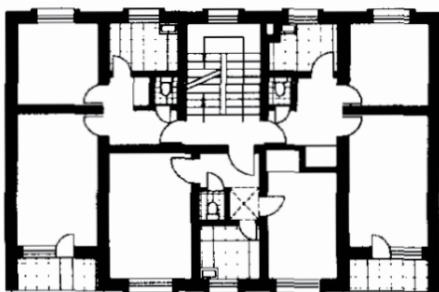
Plan of an apartment with short-open corridor (from Lu Junhun 2001, 155)
